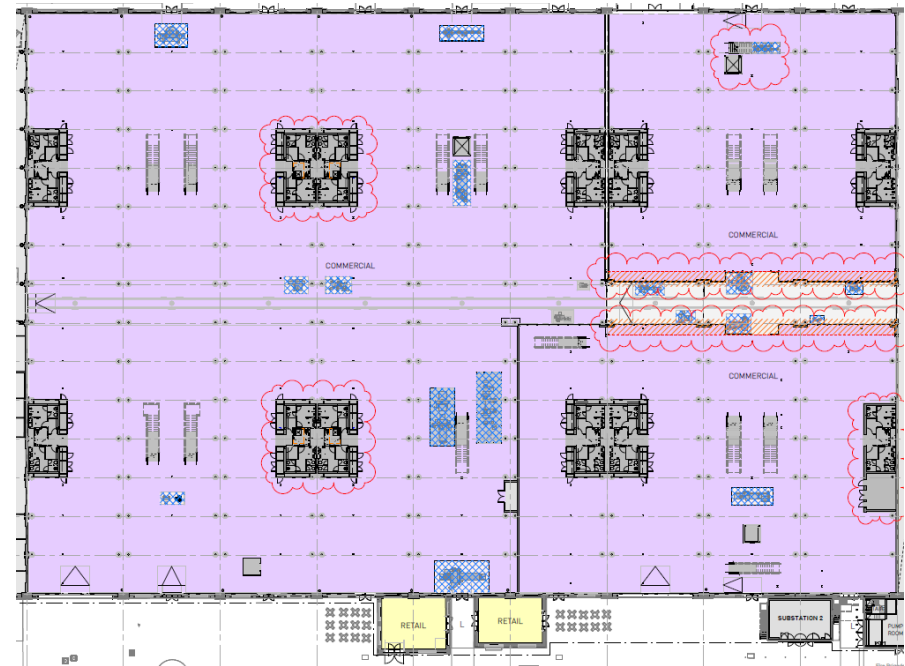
Proposed Ground Floor Plan (Source: Sissons, 2020)
